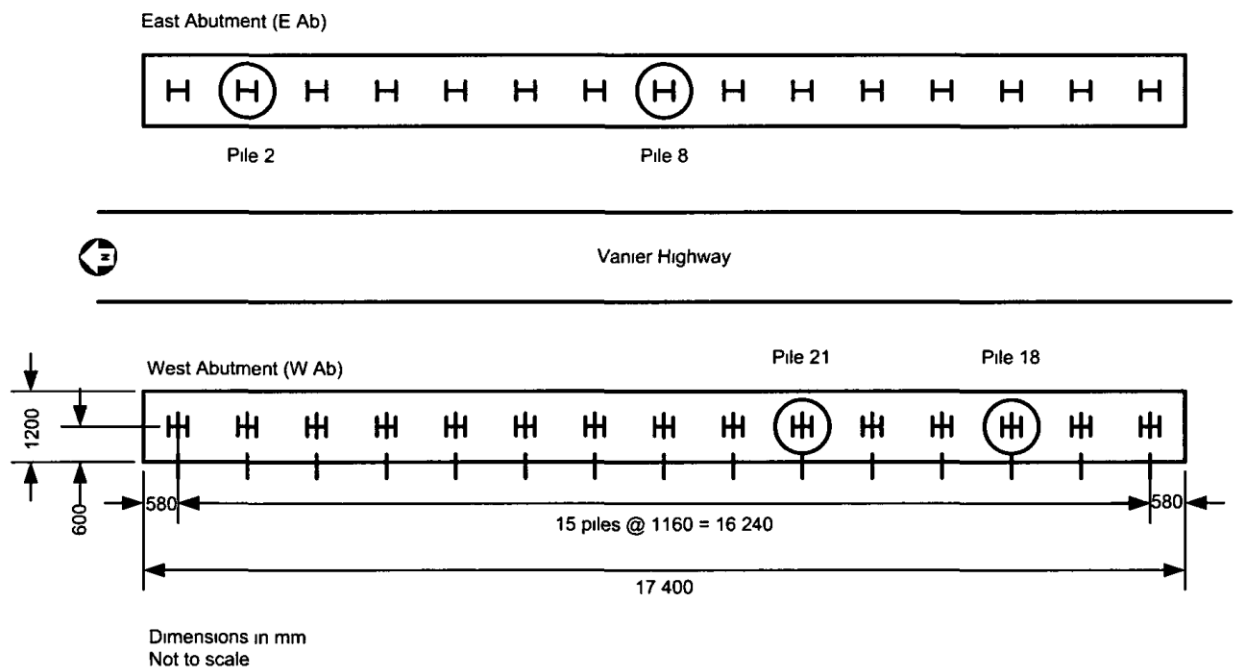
Plan view of abutment piles with the piles selected for instrumentation indicated (Huntley, 2009).
